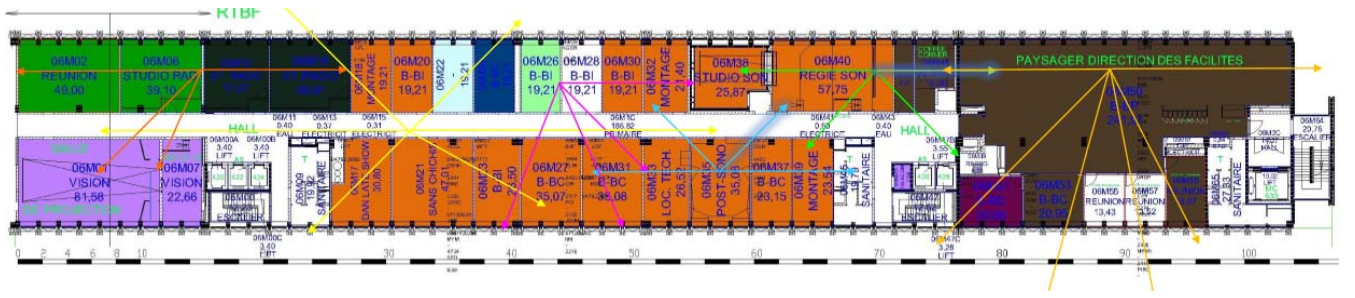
Design at 2.4 GHz for Floor 6 in Building CHJM
